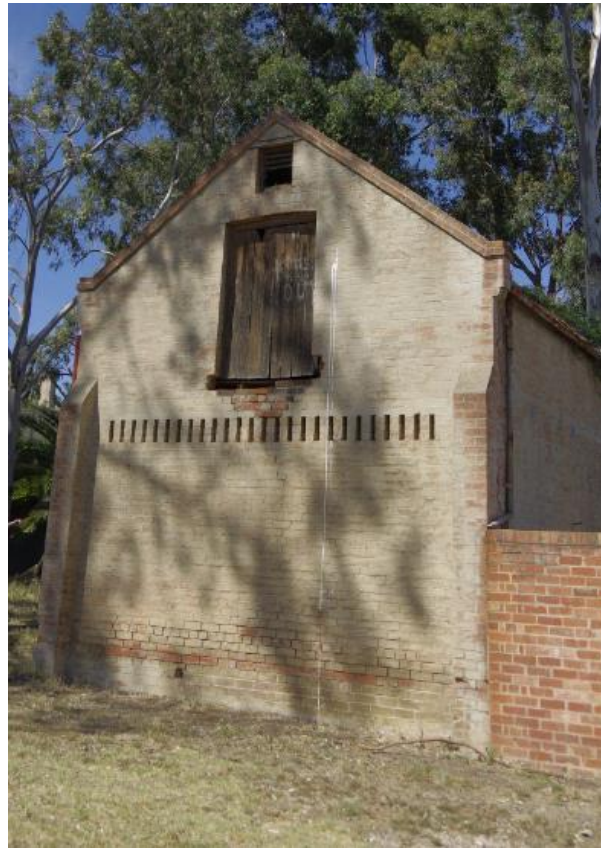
North elevation with unpainted timber loft doors, and brick butresses. (Source: Context, November 2019)
